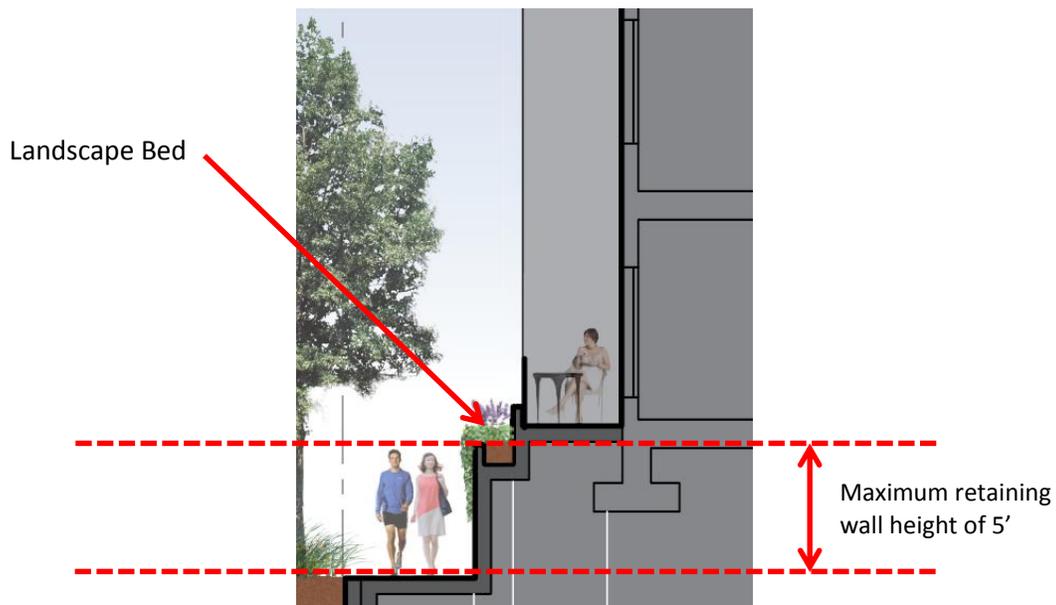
Sidewalk-adjacent retaining wall requirements.
